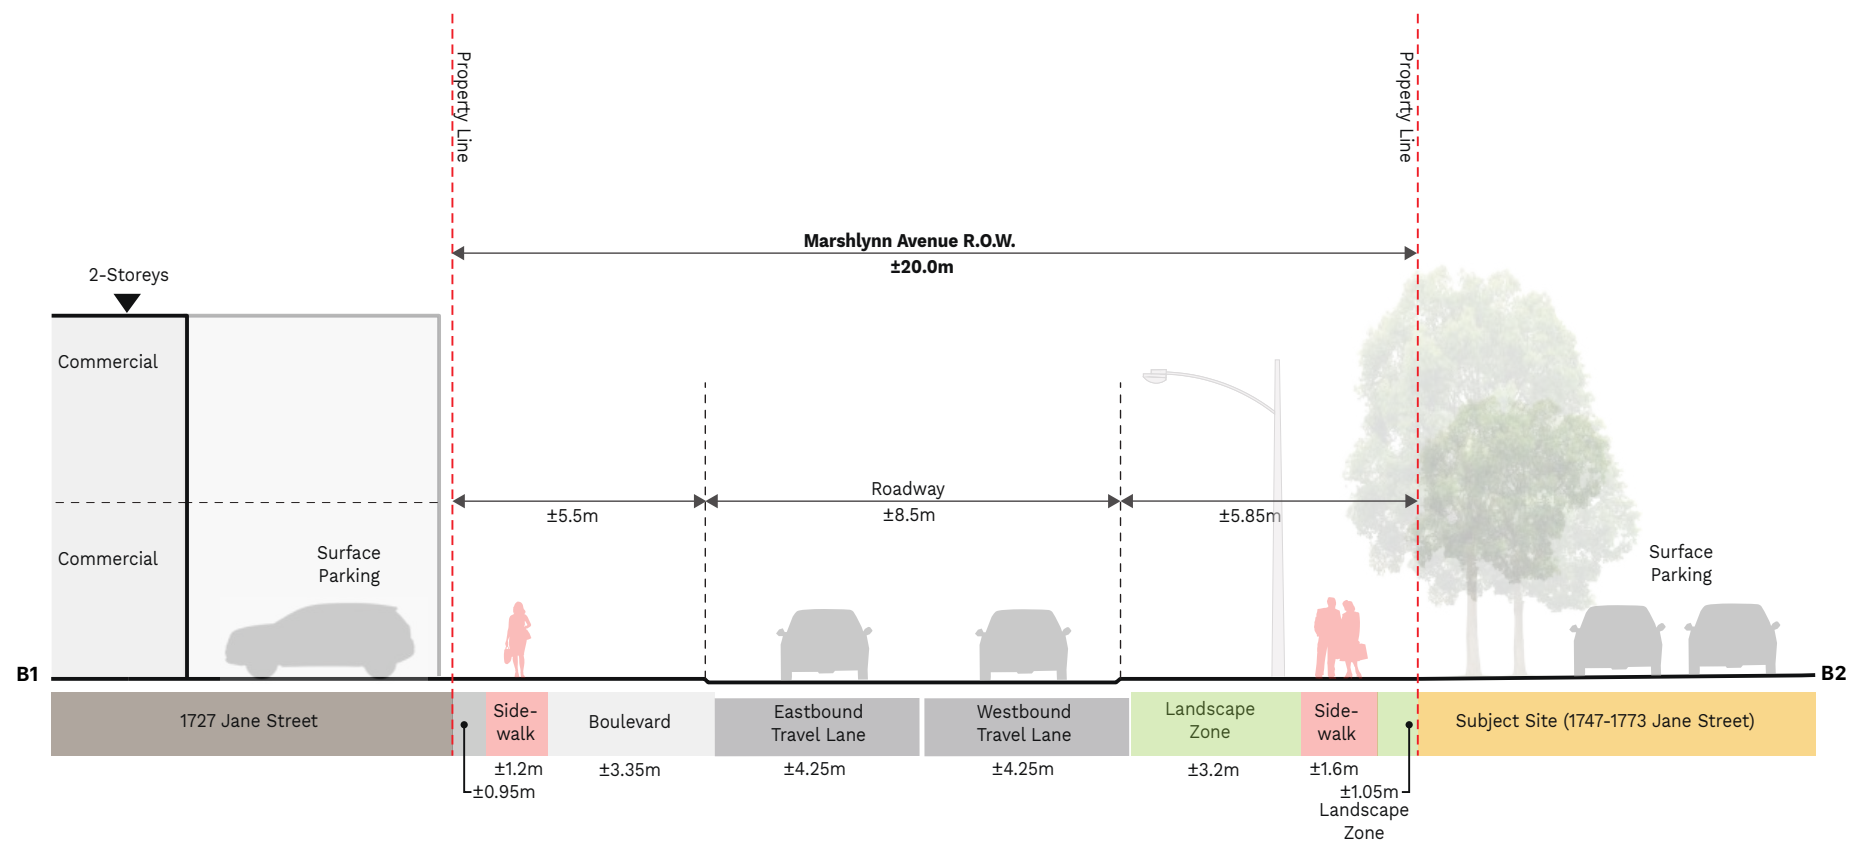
Existing Section through Marshlynn Avenue (B1-B2)
